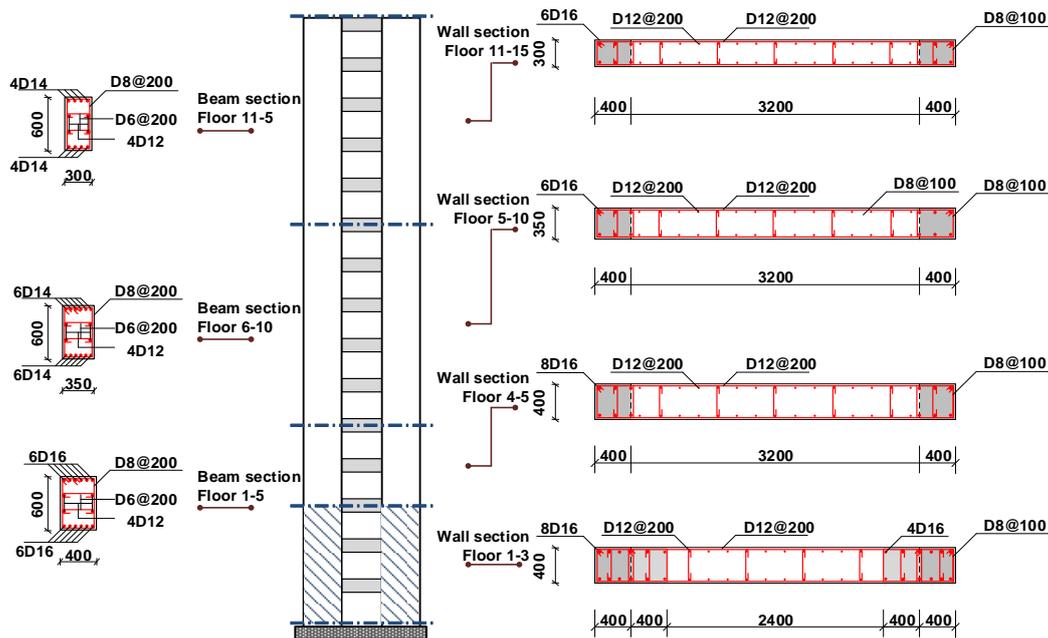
Wall dimensions and reinforcement details (unit: mm)
